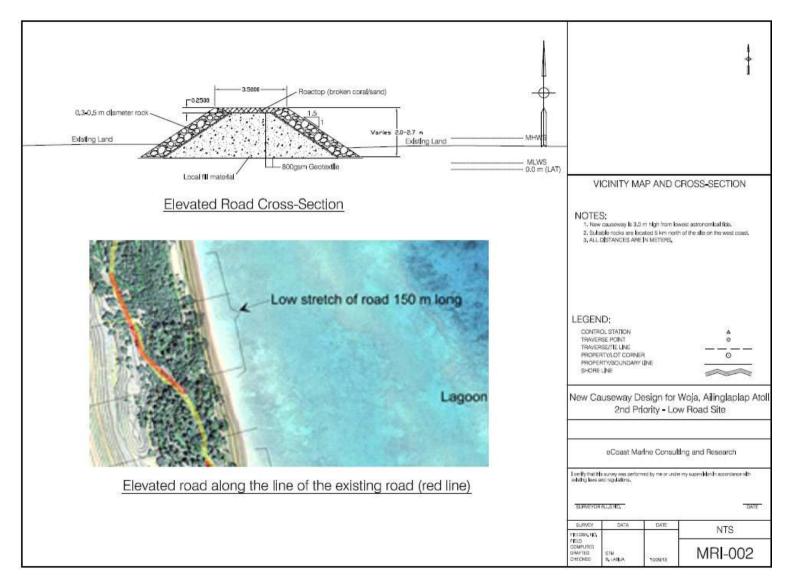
Location and cross-section for Priority 2 northern elevated road.
